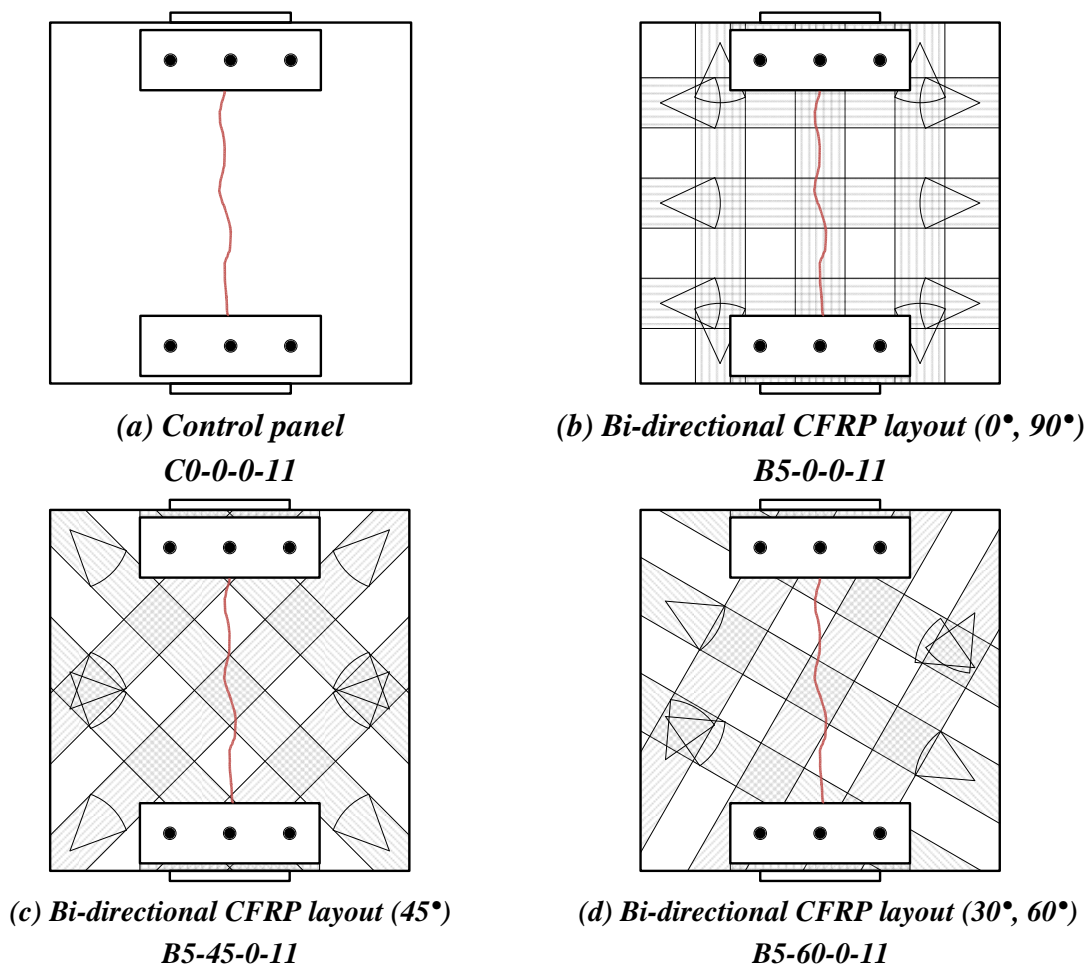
CFRP layouts for the high strength (11.5 ksi) concrete
